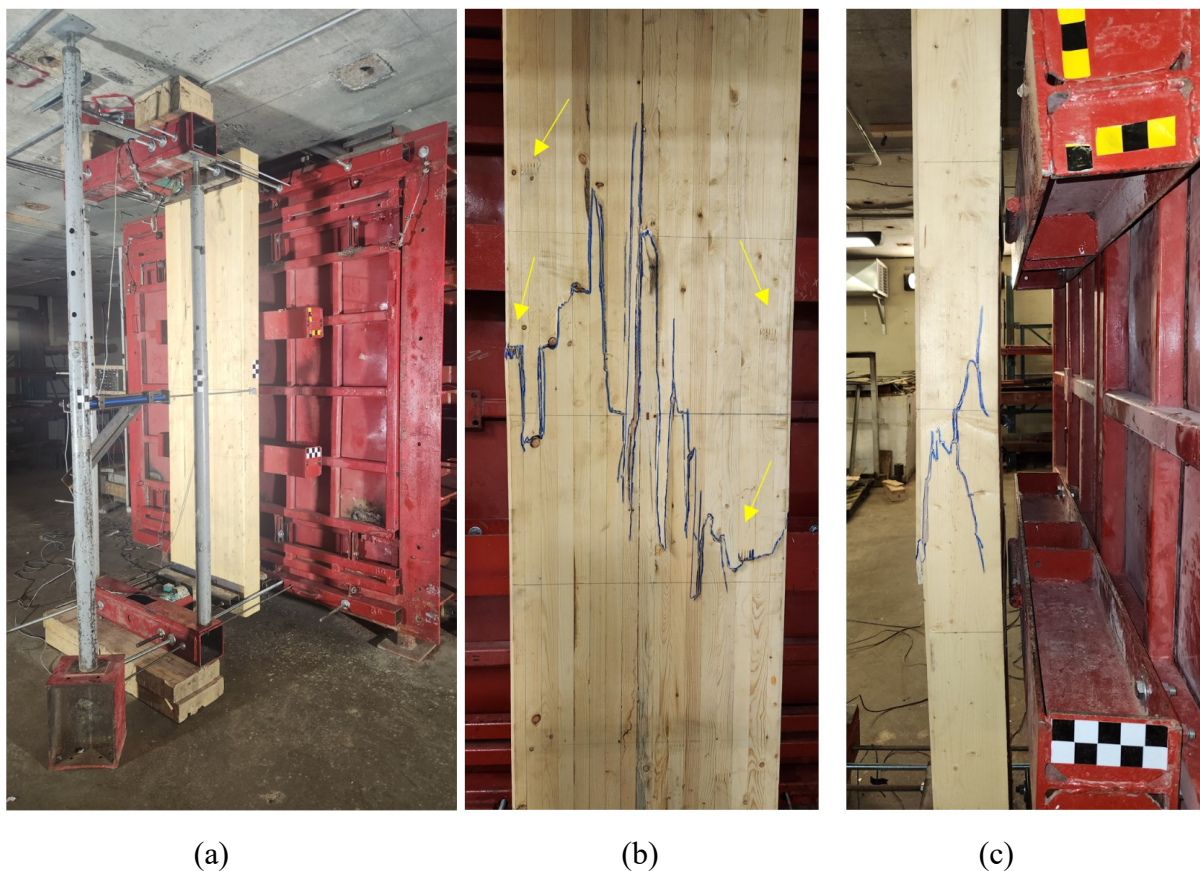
Dynamic Failure of GLT8 [130]: (a) Before test; (b) After test - front view with FJ locations; (c) After test - side view
